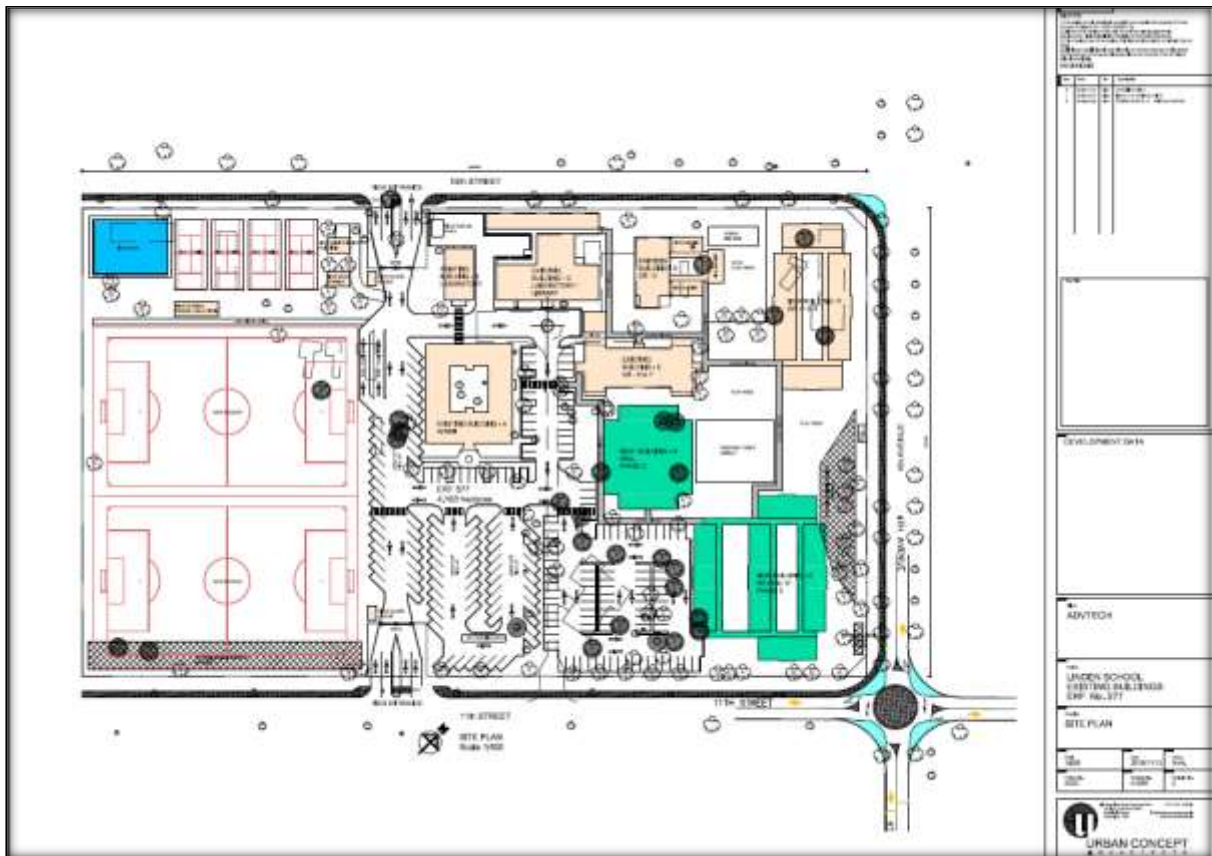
Site Layout Plan (courtesy Urban Concept Architects).
